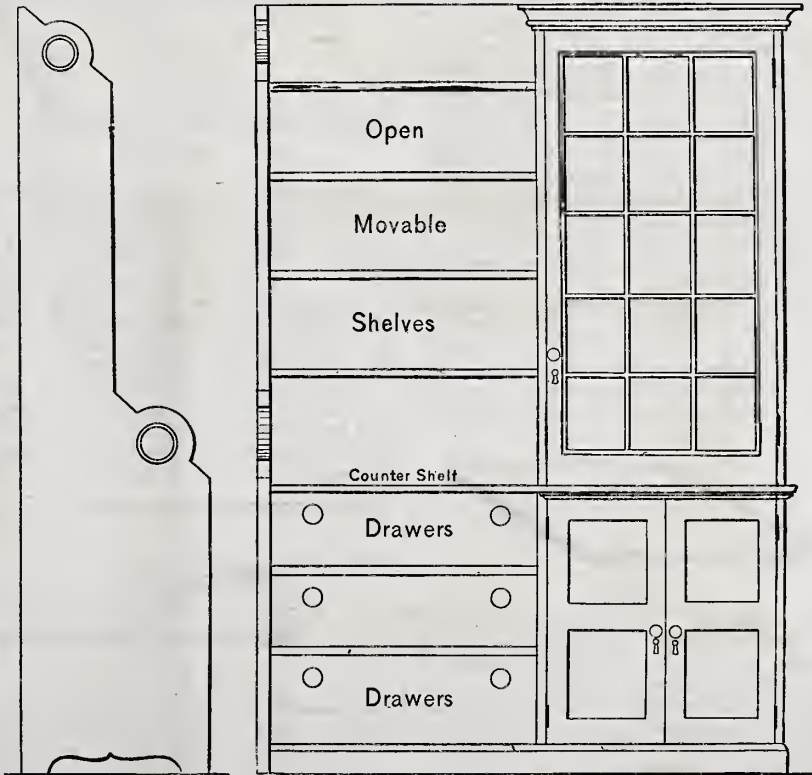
Kitchen Dresser.—Scale, 1/2-inch = 1 foot.
